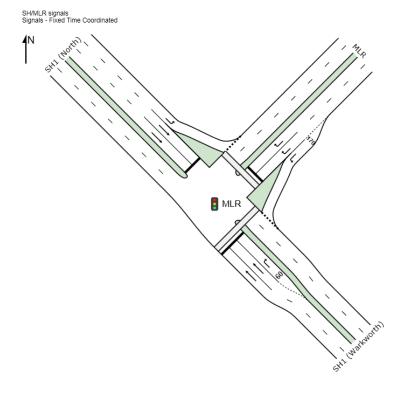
SIDRA layout for Matakana link road / SH1 intersection
